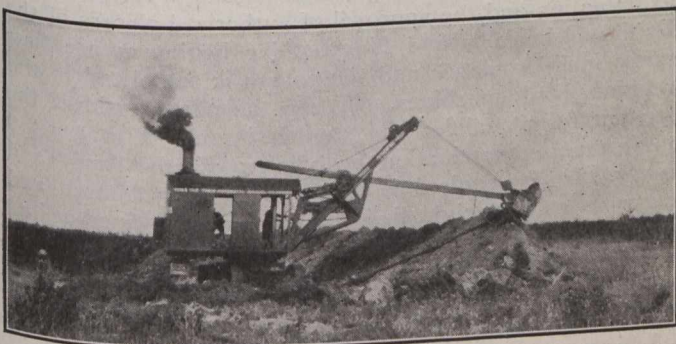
Thew Shovel Excavating in Heavy Soil.
